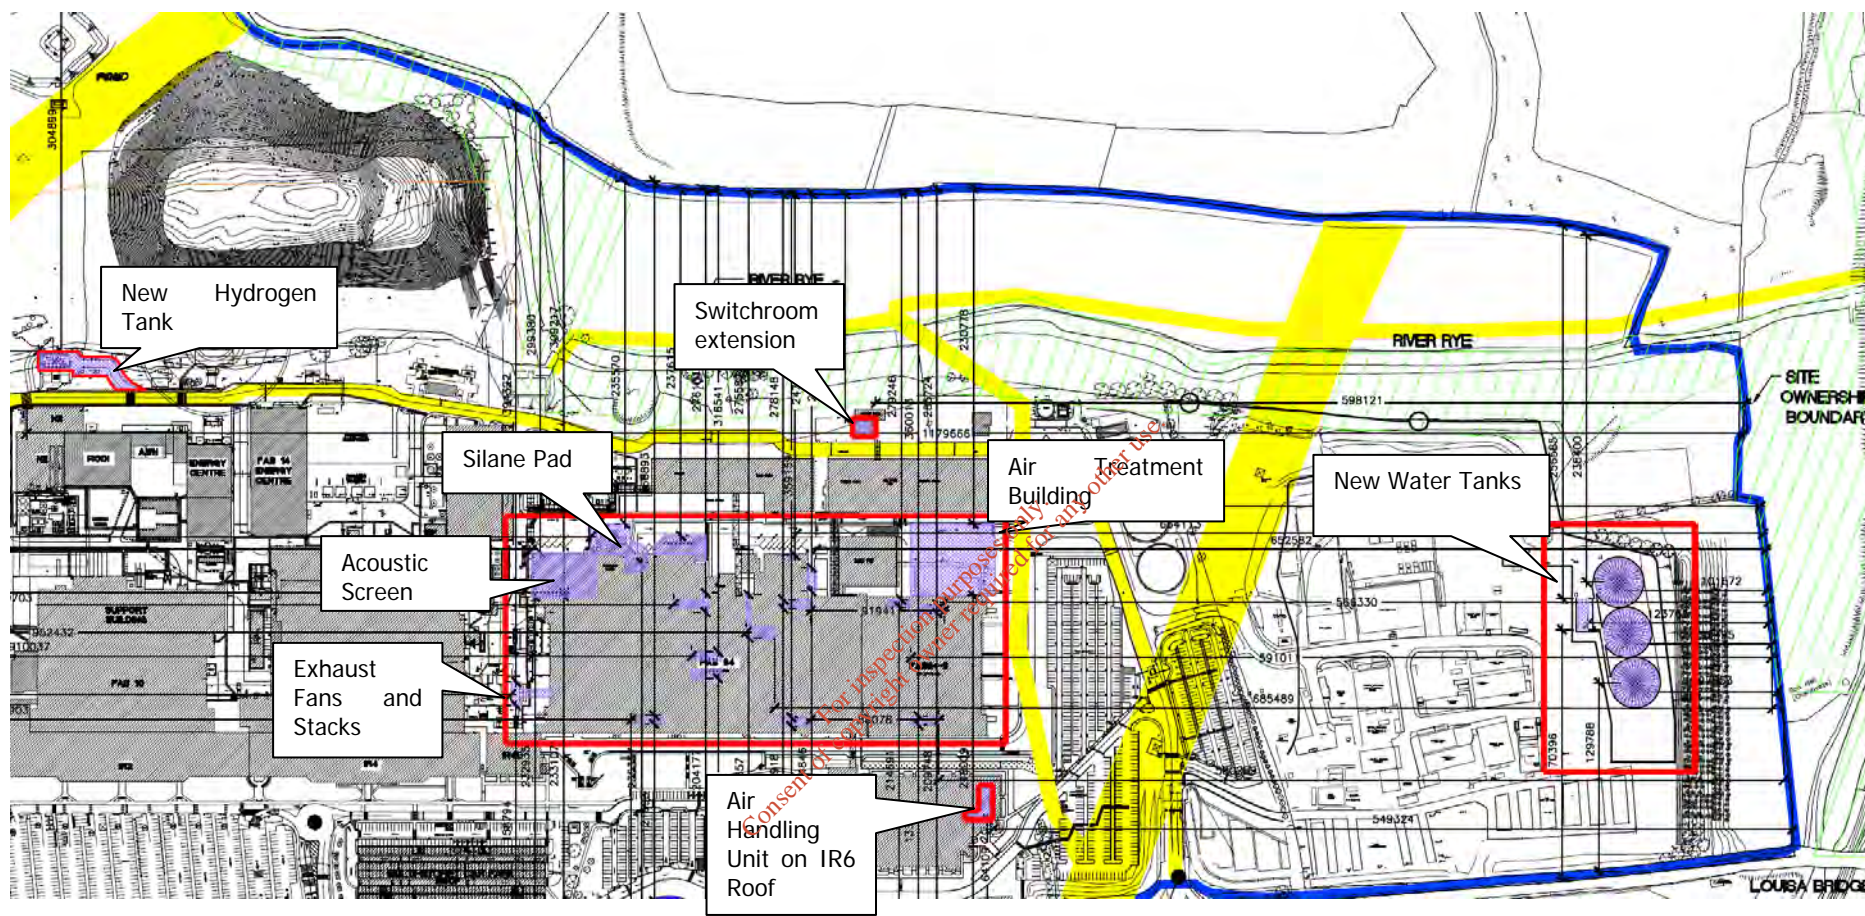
Site layout with areas of proposed development outlined in red (Air Handling units in Fab24 also shown in purple)
